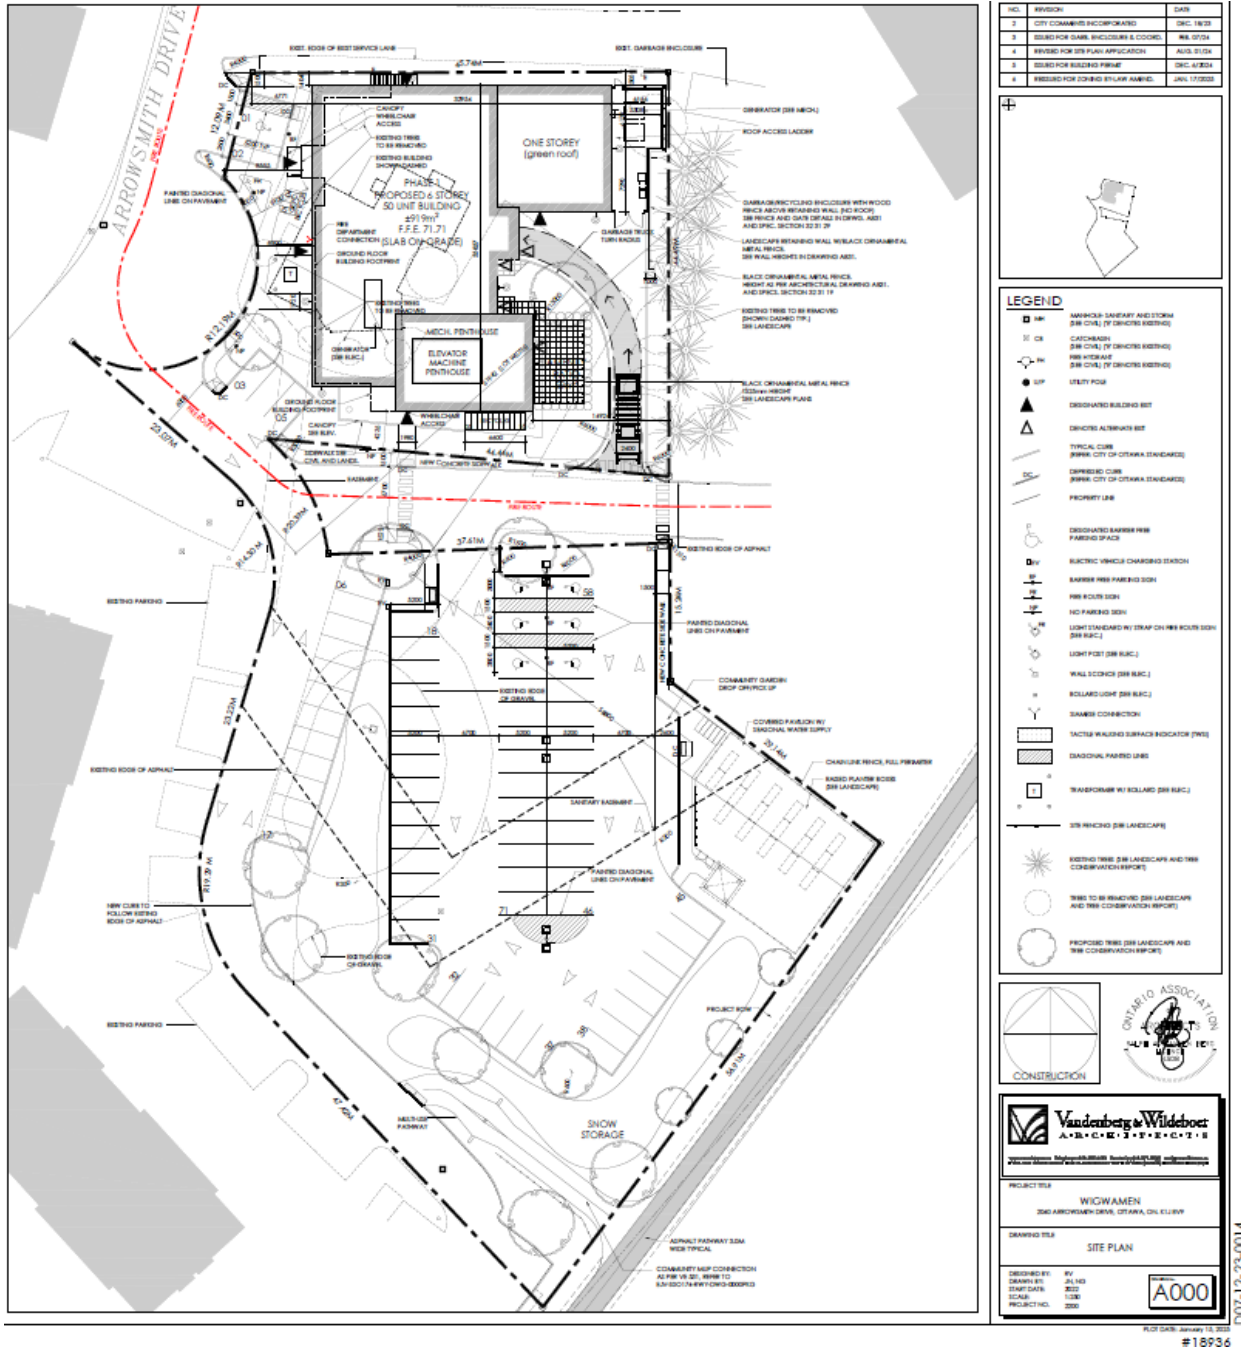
Proposed site plan showing location of building, parking, and landscaping. Source: Site Plan, Drawing A000, prepared by Vandenberg and Wildeboer Architects, dated 2022, revision 6 dated January 17, 2025.
